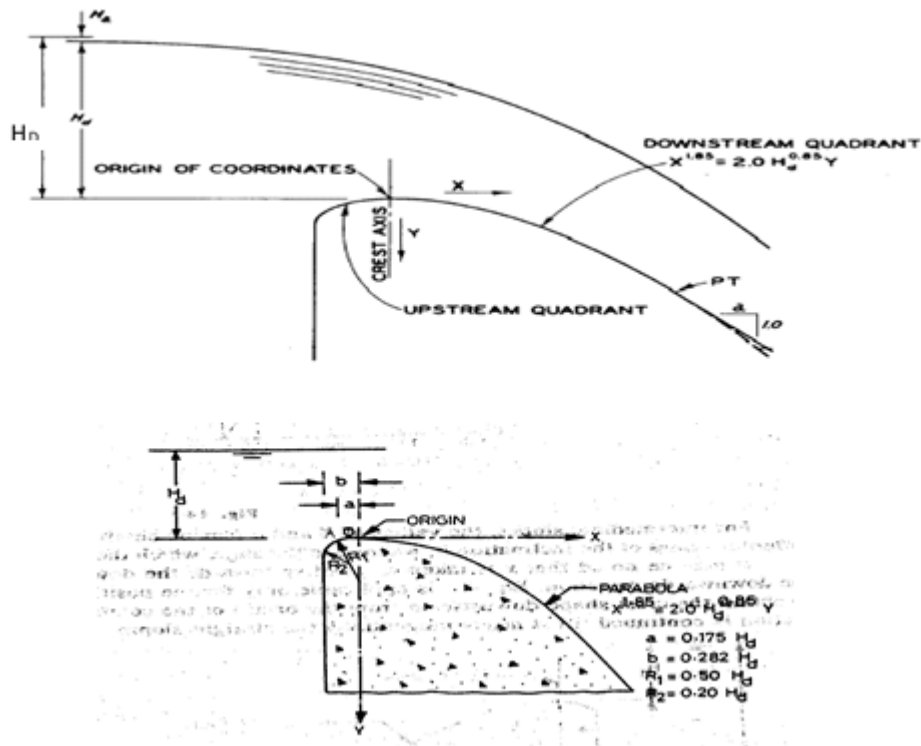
WES- standard spillway shape (vertical upstream face)
